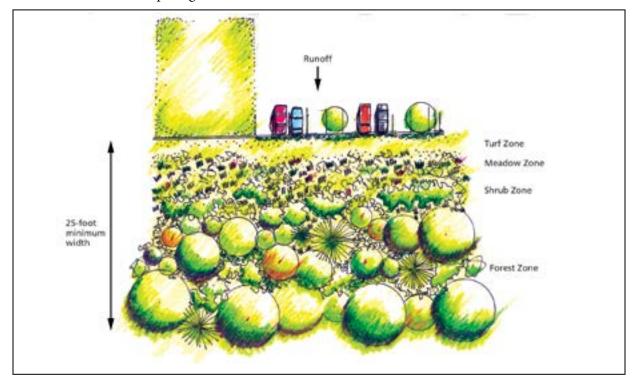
A multi-zone filter strip (plan) requires a minimum width of 25 feet.
